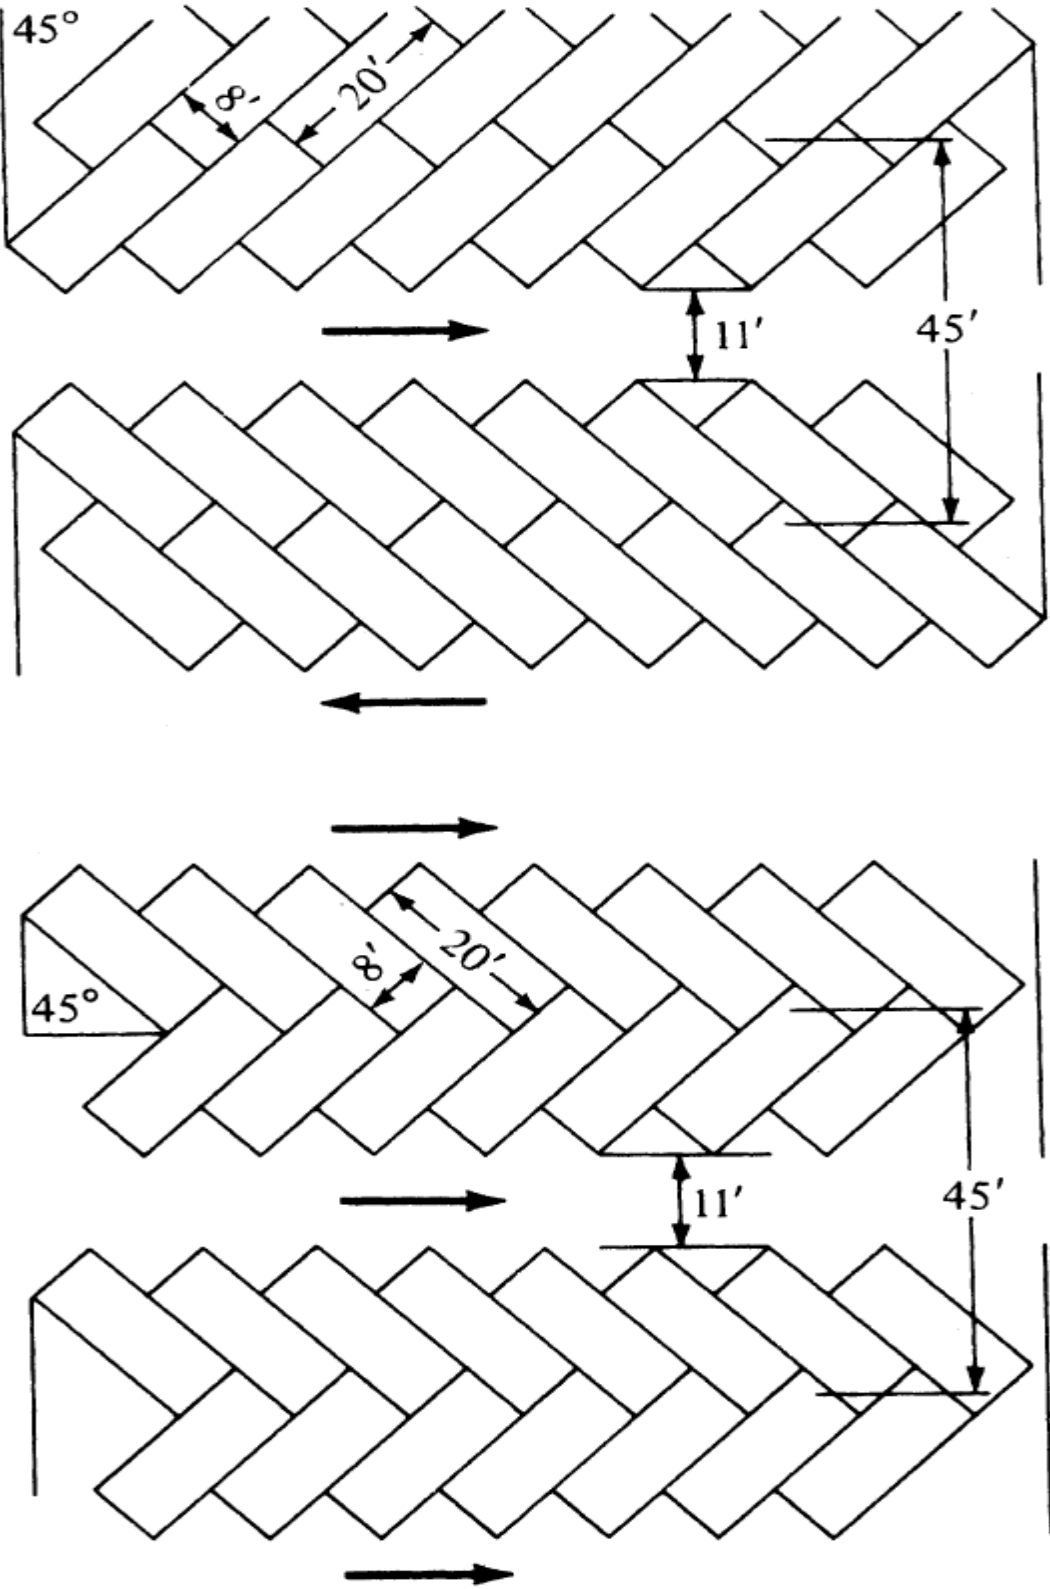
Herringbone Layout of Parking Stalls in an On-Surface Lot
